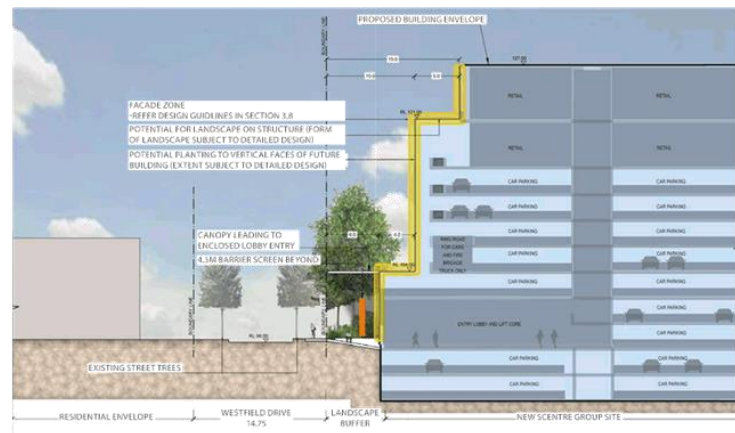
Section B-B, Proposed section showing typical landscape treatment through proposed pedestrian entry from Westfield Drive (Floor levels are indicative only)
